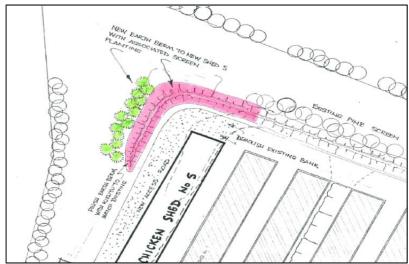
Proposed extension of landscaping and berm near corner of new shed – new mound in pink, new trees in green
